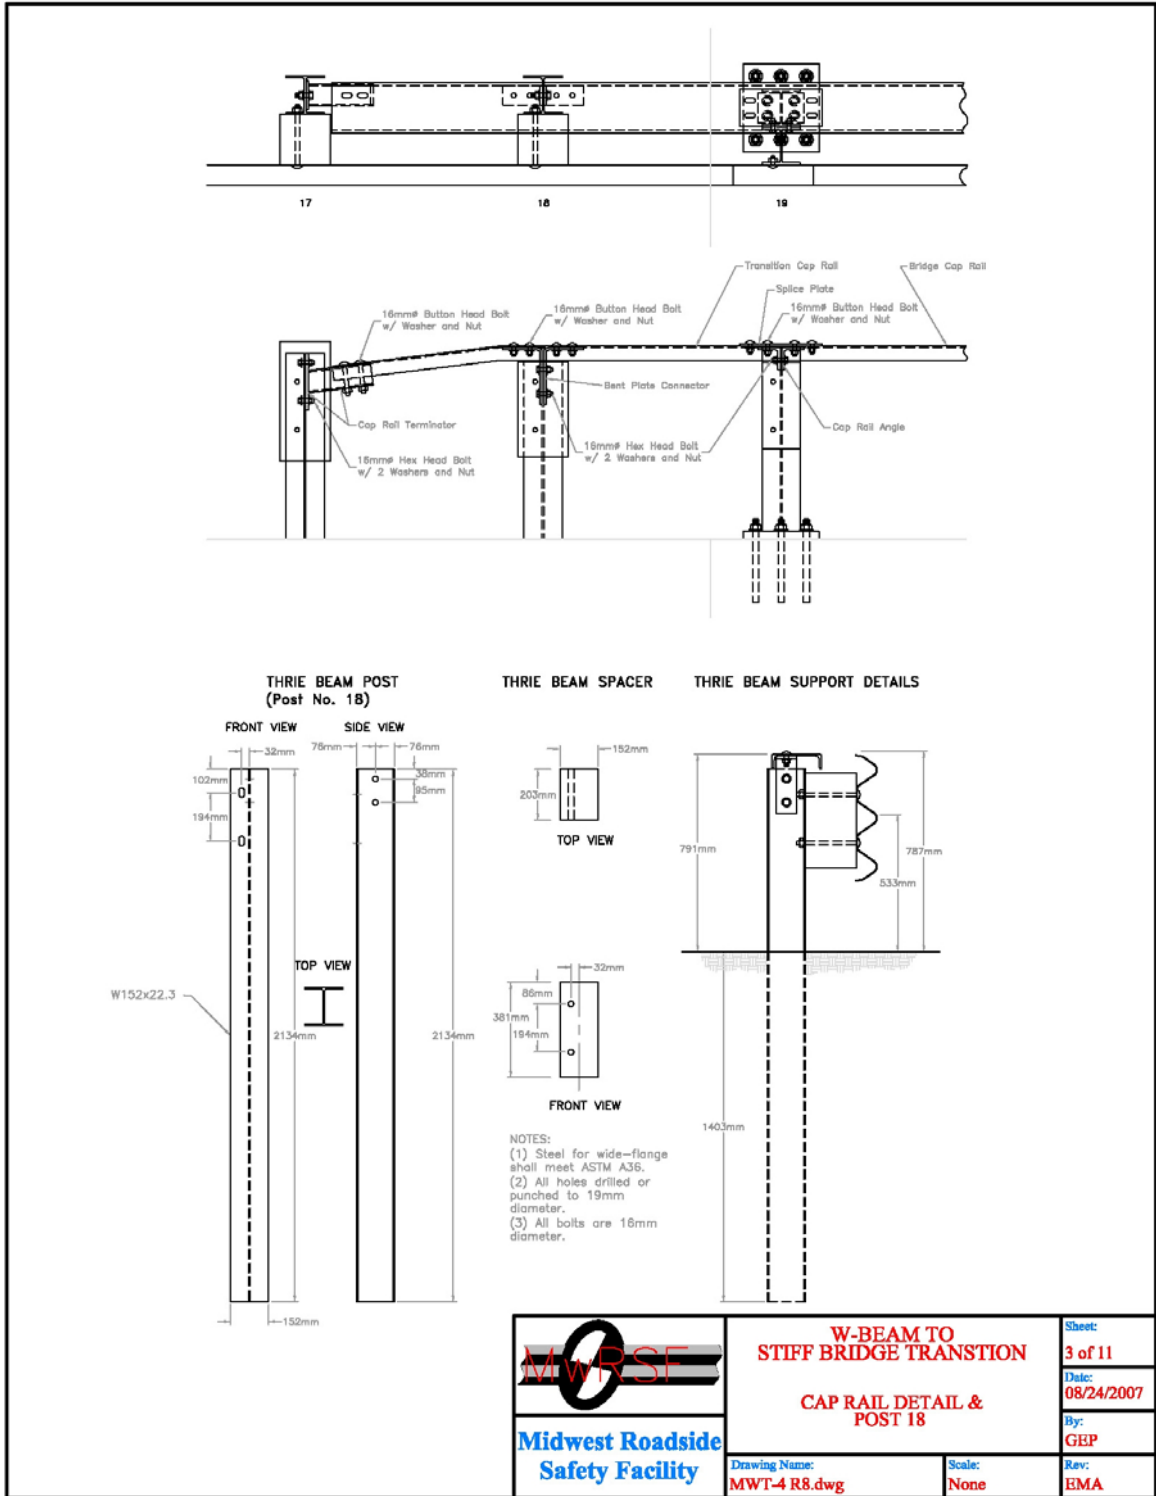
Cap Rail and Post No. 18 Details (Design No. 2)
